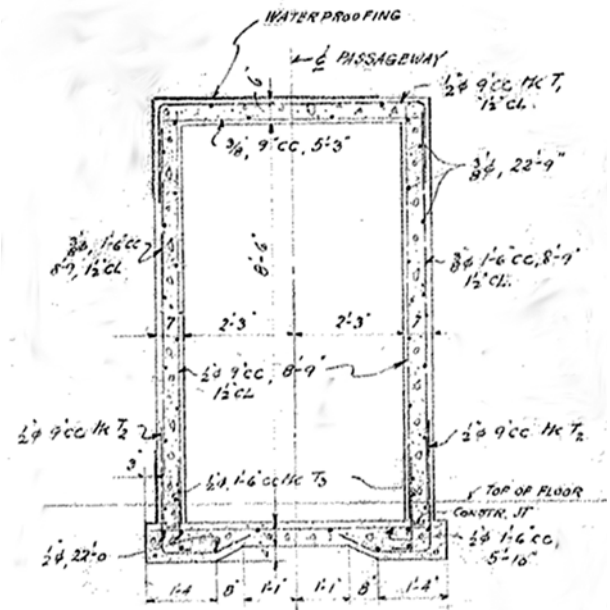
Detail from original construction drawings showing presumed section through concrete shell for entrance passageway. (OCMU Coll.)
